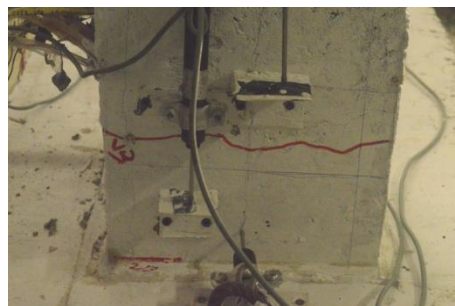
Specimen CSF-0-7.5-N at initial cracking ( $0.75 \Delta y$ )
